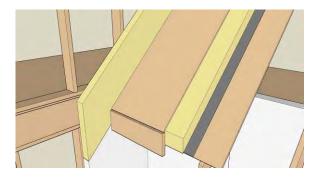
Roof construction with exterior insulation and drainage plane 1 – insulation "curb" installed prior to roofing nailbase.
